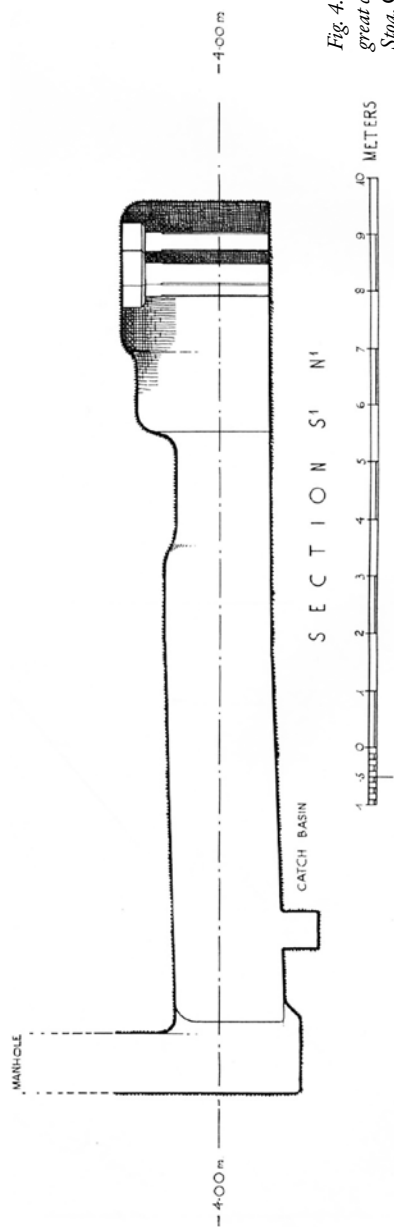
Section S1-N1 of the great cistern under the South Stoa. Corinth 1.4, plan VIII.
